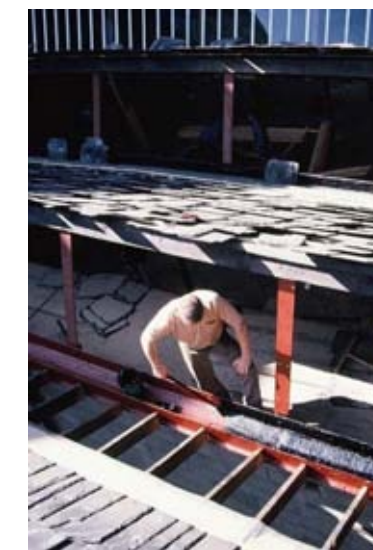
Sections of roof being removed at Trafalgar Mill in the Weaver's Triangle, Burnley,
